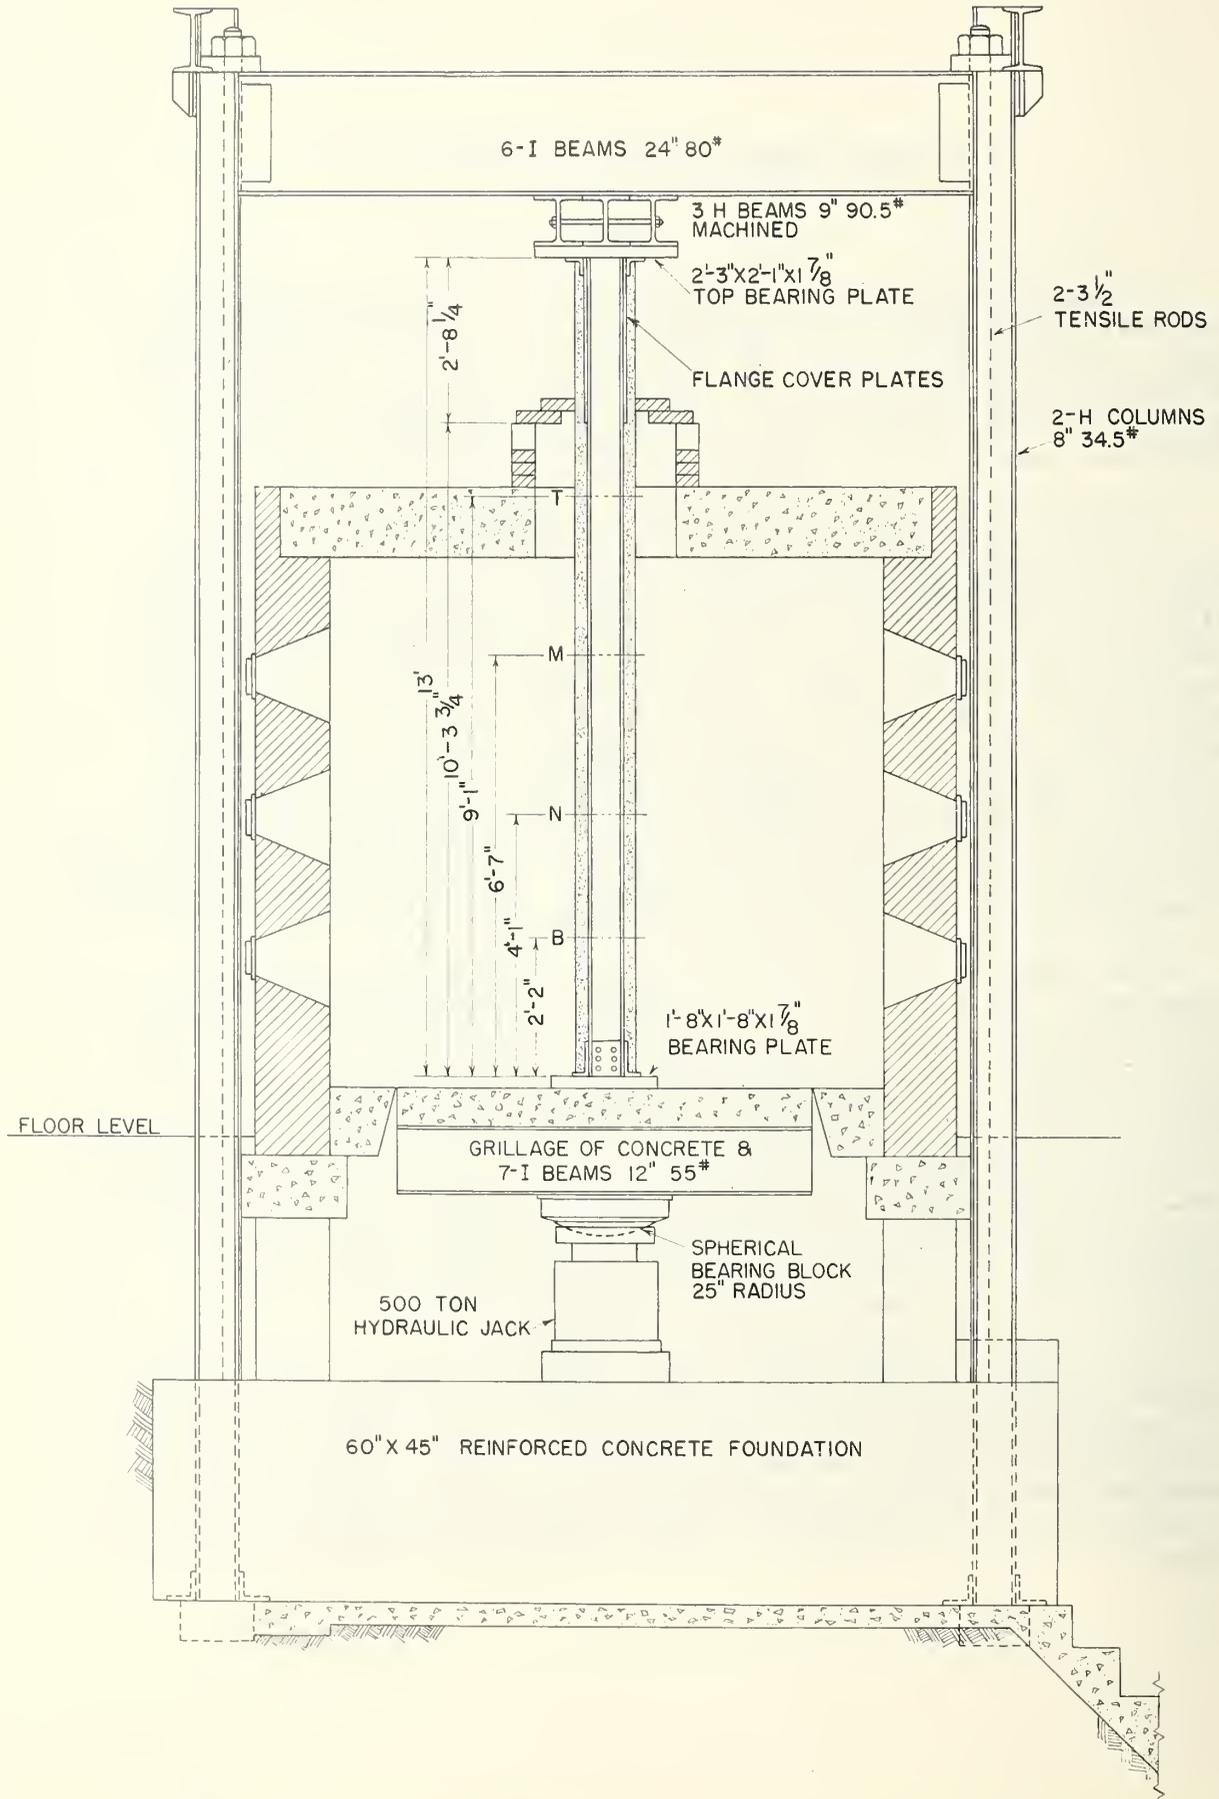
TESTS 267, 270, 271. FURNACE AND LOADING EQUIPMENT WITH TYPICAL COLUMN IN PLACE. FP2983
